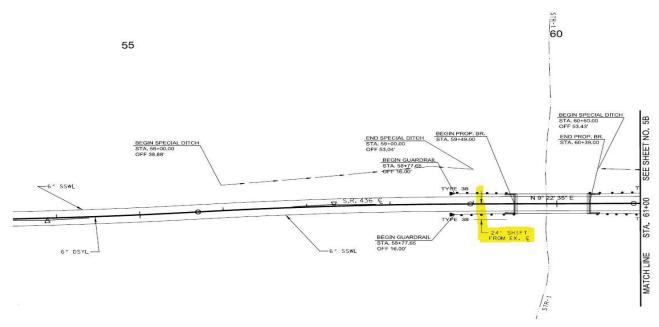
Proposed Layout of SR-436 over Reedy Creek, LM 0.68 in the 06/12/2019 Preliminary Plans.
